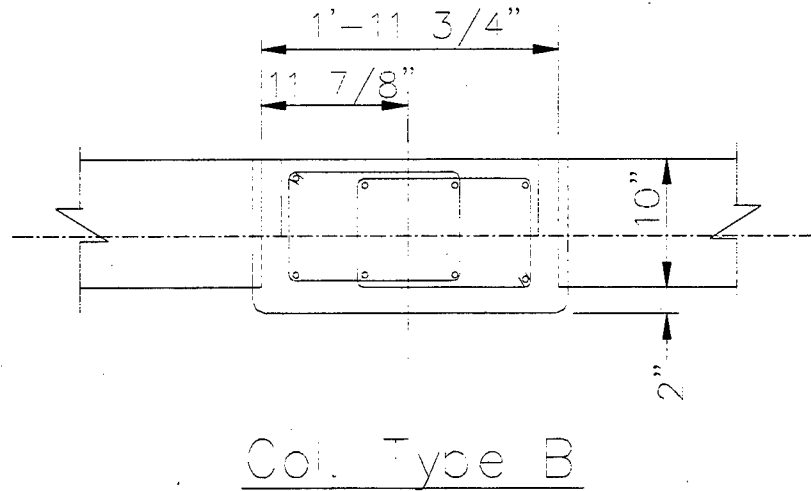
As-Built Drawing of Prototype Building, Exterior Column Detail
